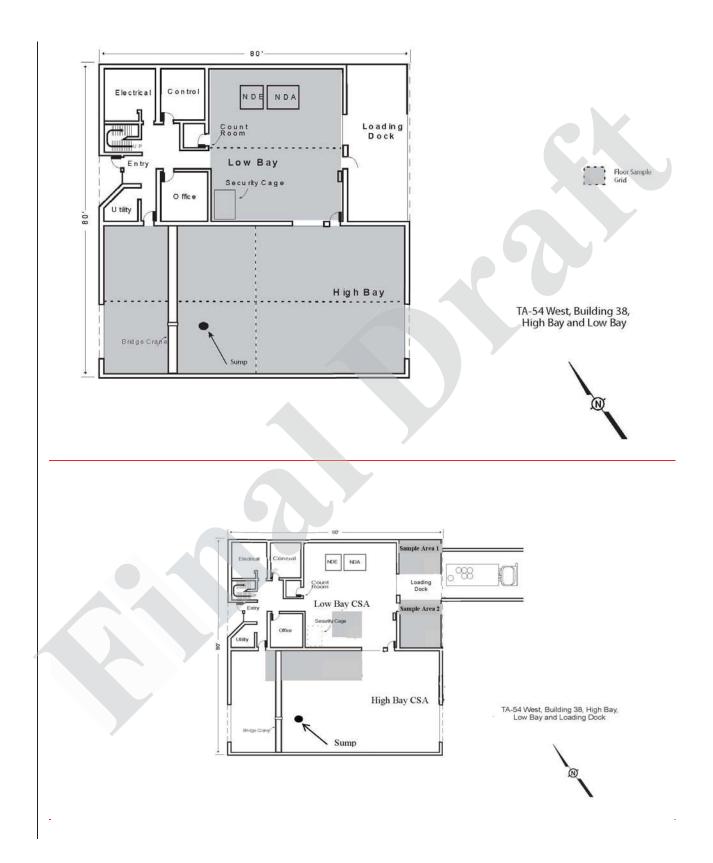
Technical Area 54, Building 38 (High, and Low Bay, and Loading Dock Sampling Locations)
